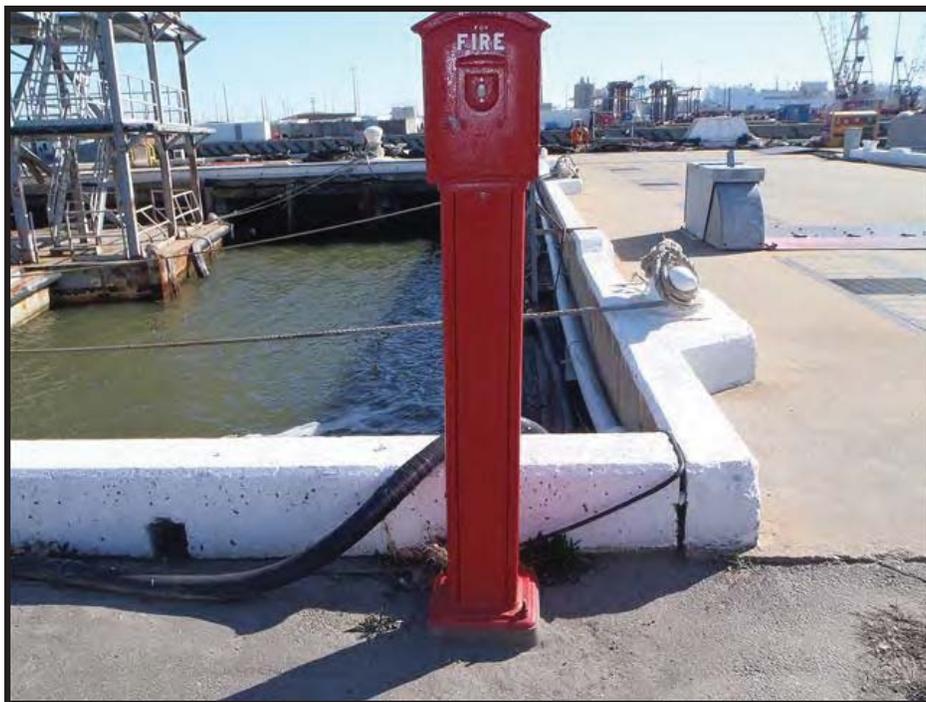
Typical view of a fire alarm, Sta. 5+90.
